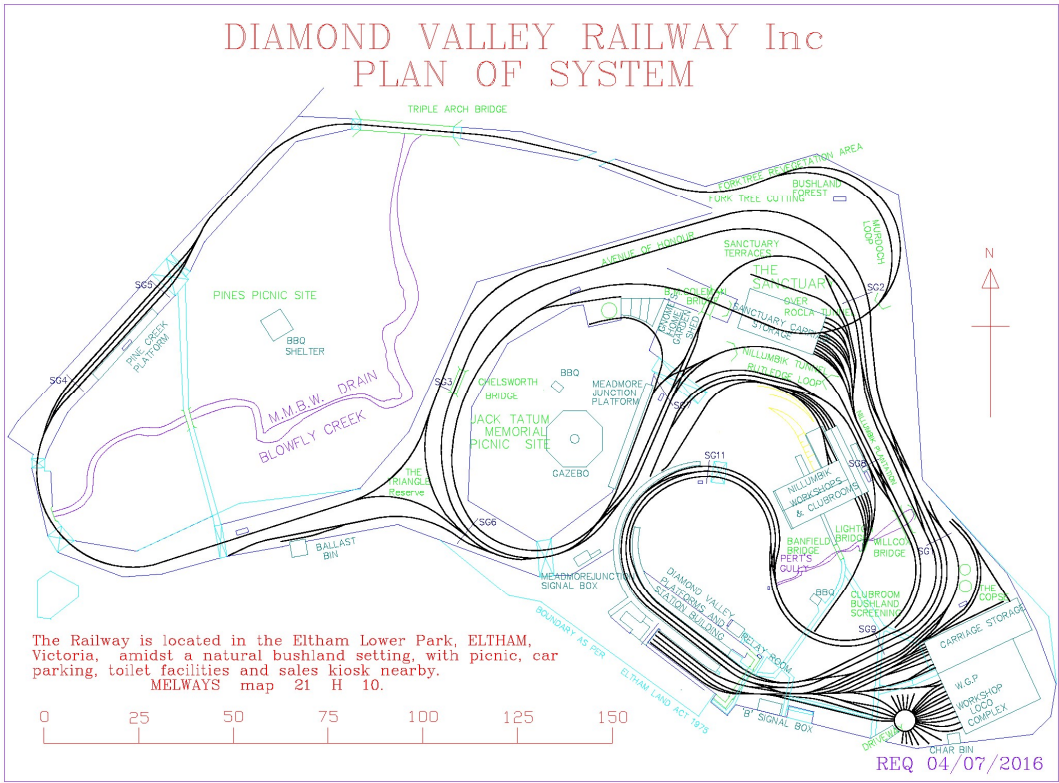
Track plan of the Diamond Valley Railway in 2016. (Source: Diamond Valley Railway)
